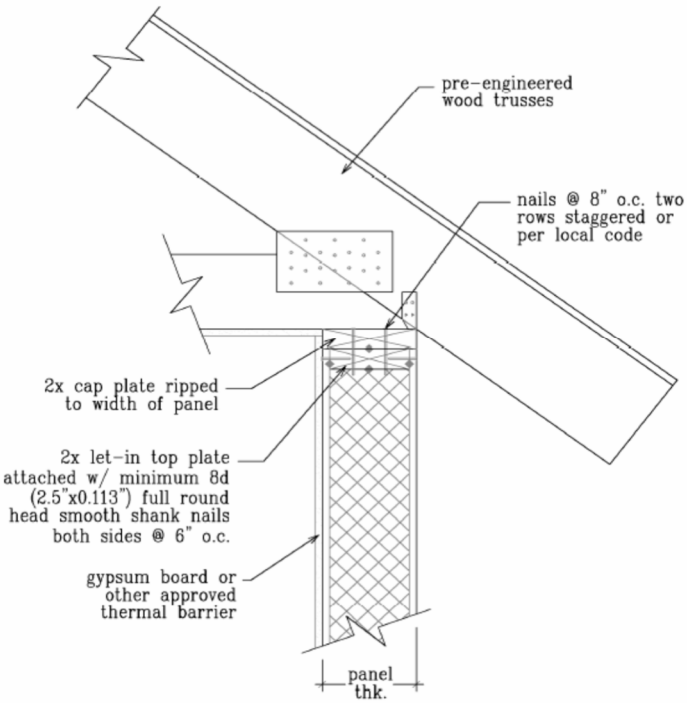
TYPICAL ROOF TRUSS TO WALL PANEL
